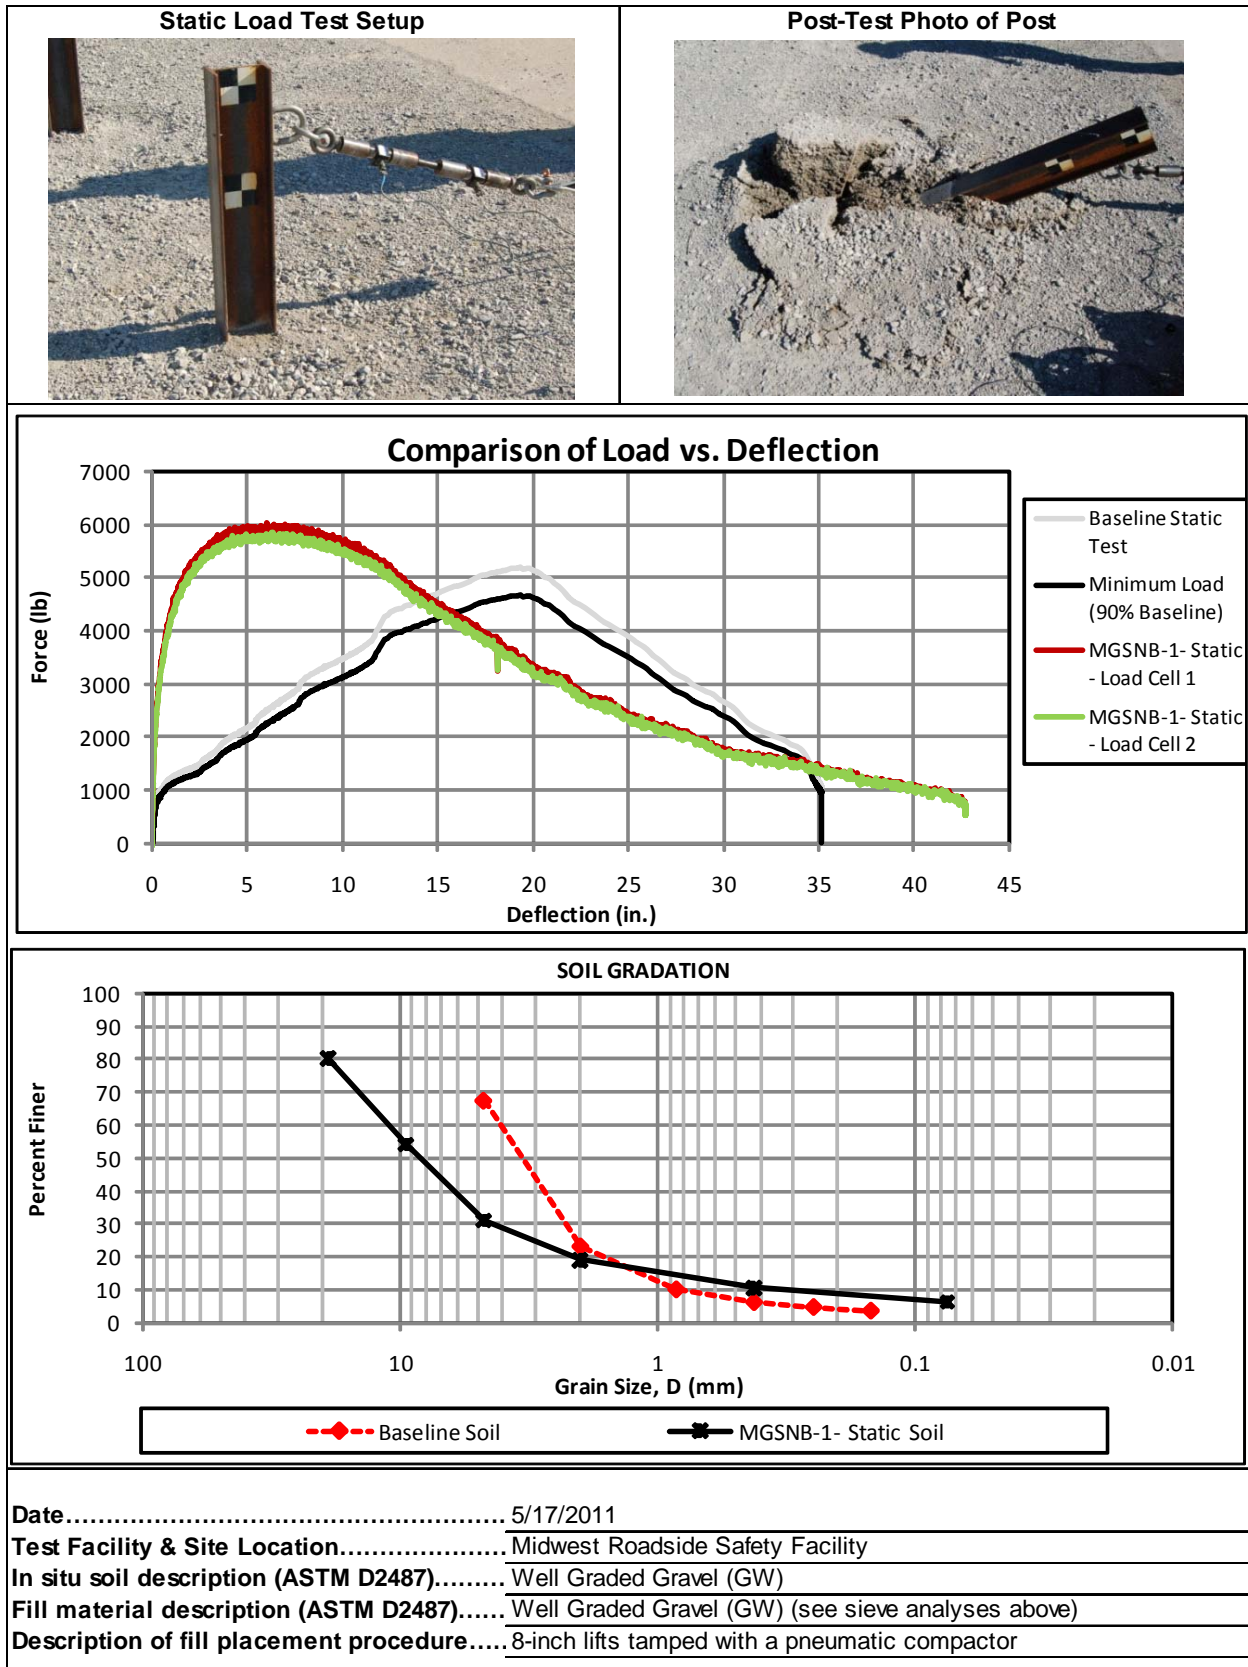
Test Day Static Soil Strength, Test No. MGSNB-1
